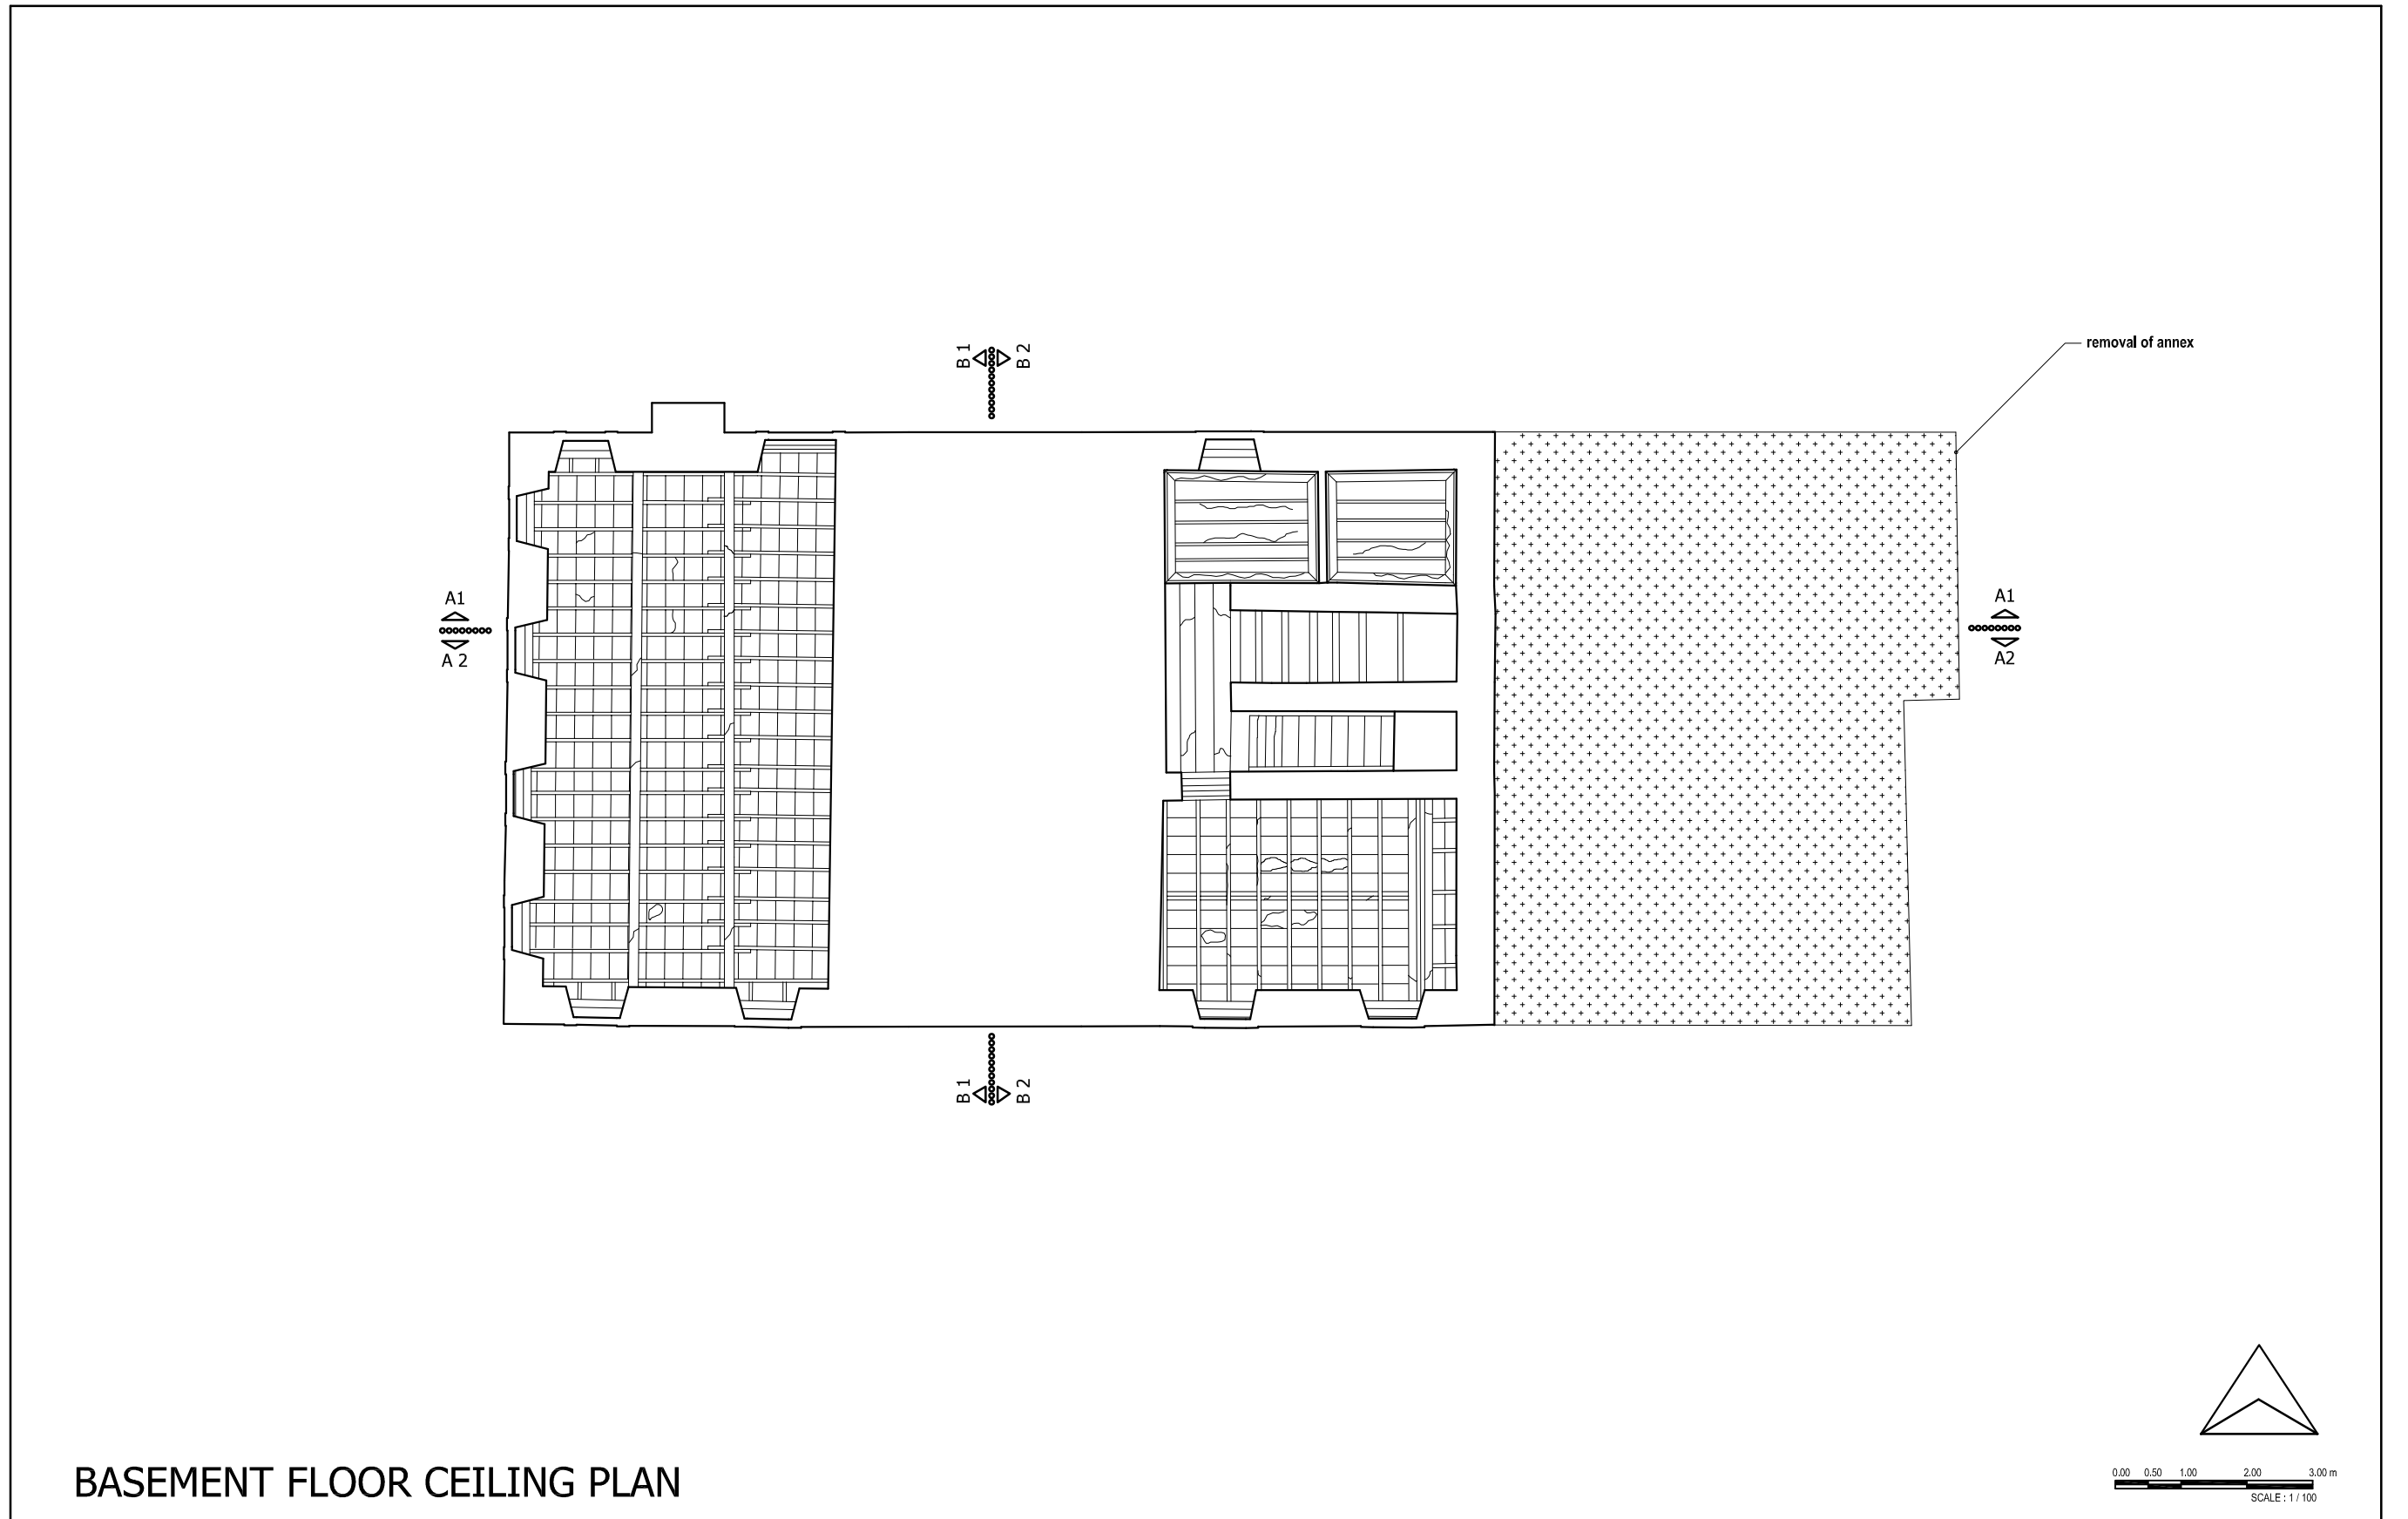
Measures for Ethics of Conservation- Basement Floor Ceiling Plan
